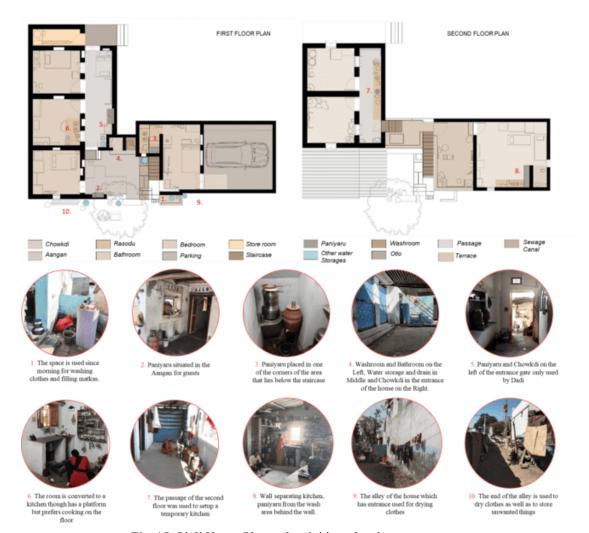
Pipli House Plan and activities related to water spaces Source: Author
